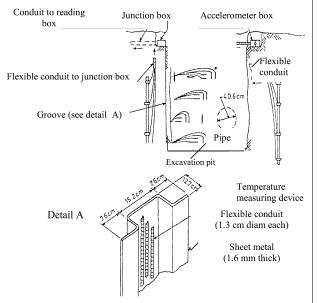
Placement of soil pressure cell in fill of excavation pit [18]
